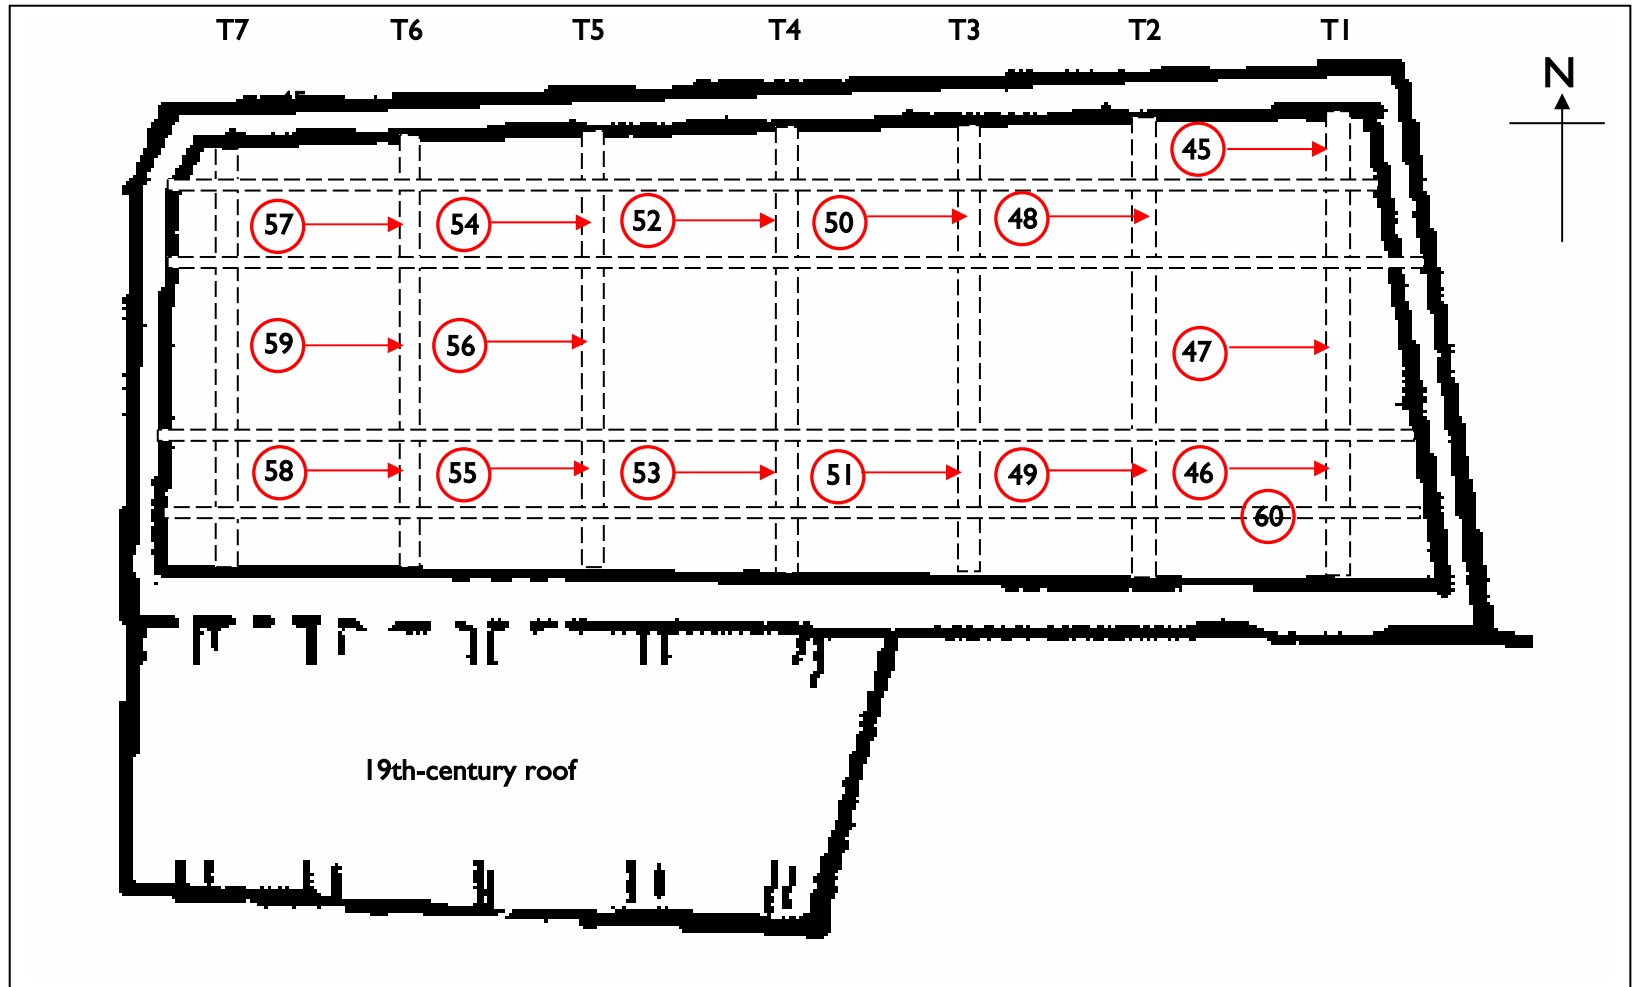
Plan to show approximate position of sampled timbers from the roof of The Old Standard (after Eric Berry and Nicholas Cahill)
